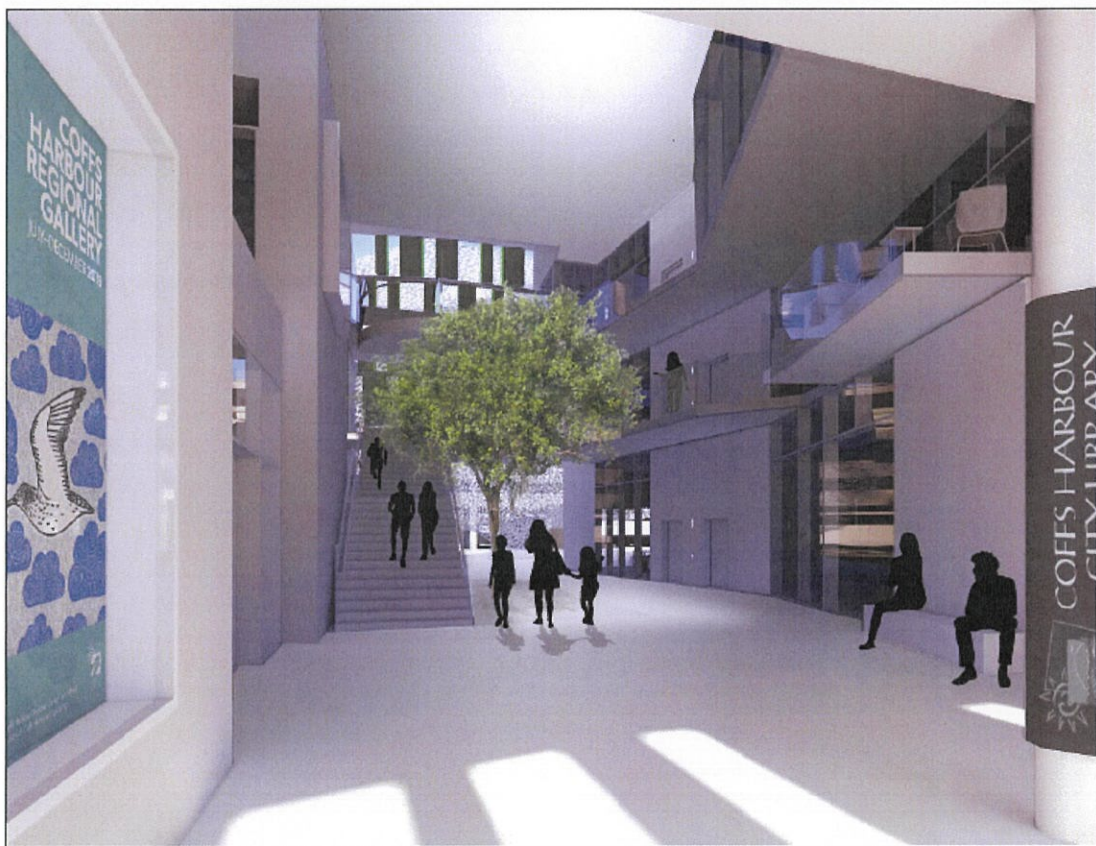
| View of through-site link, connecting Gordon Street and Riding Lane (source: Applicant's Design Report)
